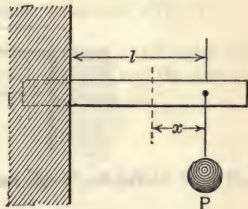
Cantilever Beam. Concentrated Load near Free End
